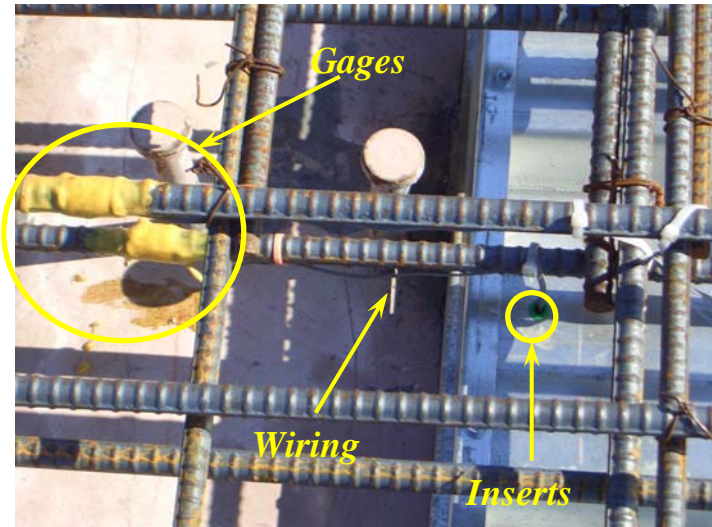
Strain gages on the deck reinforcement and wire placement
